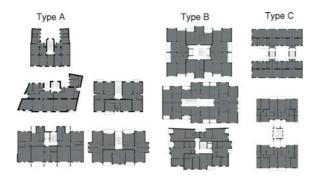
Examples of different positions of a staircase within a floor plan of a building
